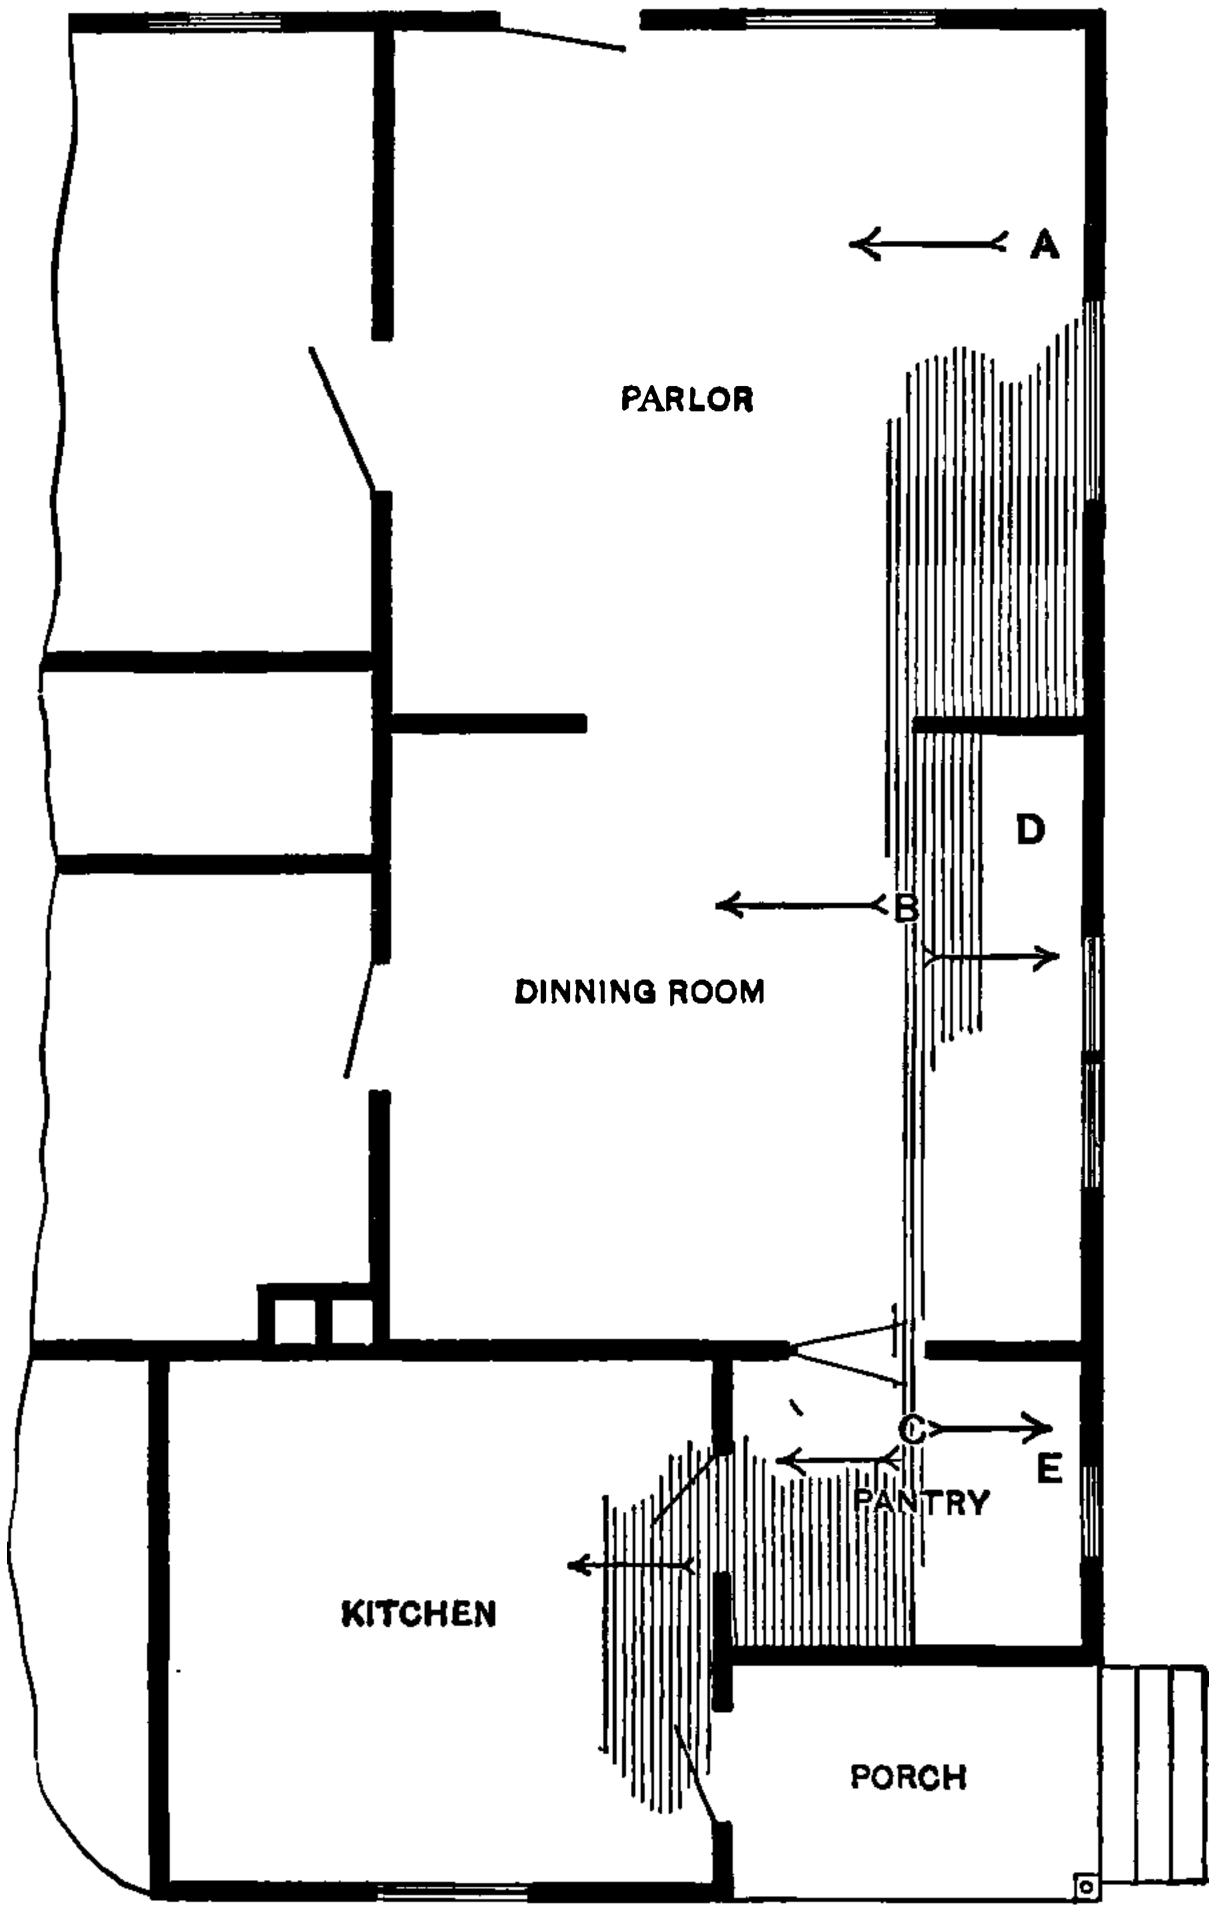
Partial Plan: Showing Method of Joining Floors in Adjacent Rooms.
